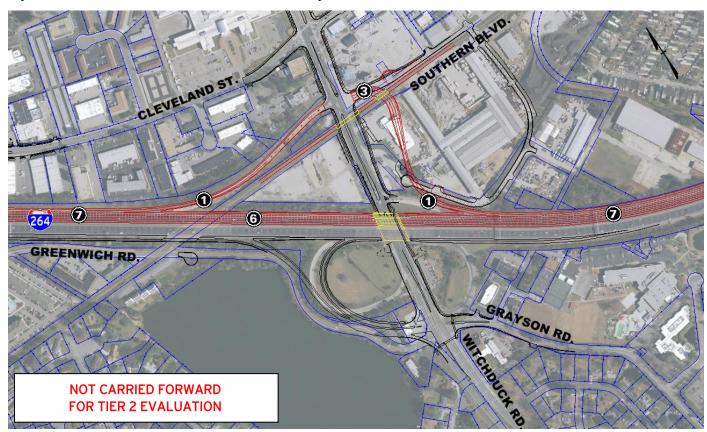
Tier 1 I-264/Witchduck Road Interchange Alternative 1
